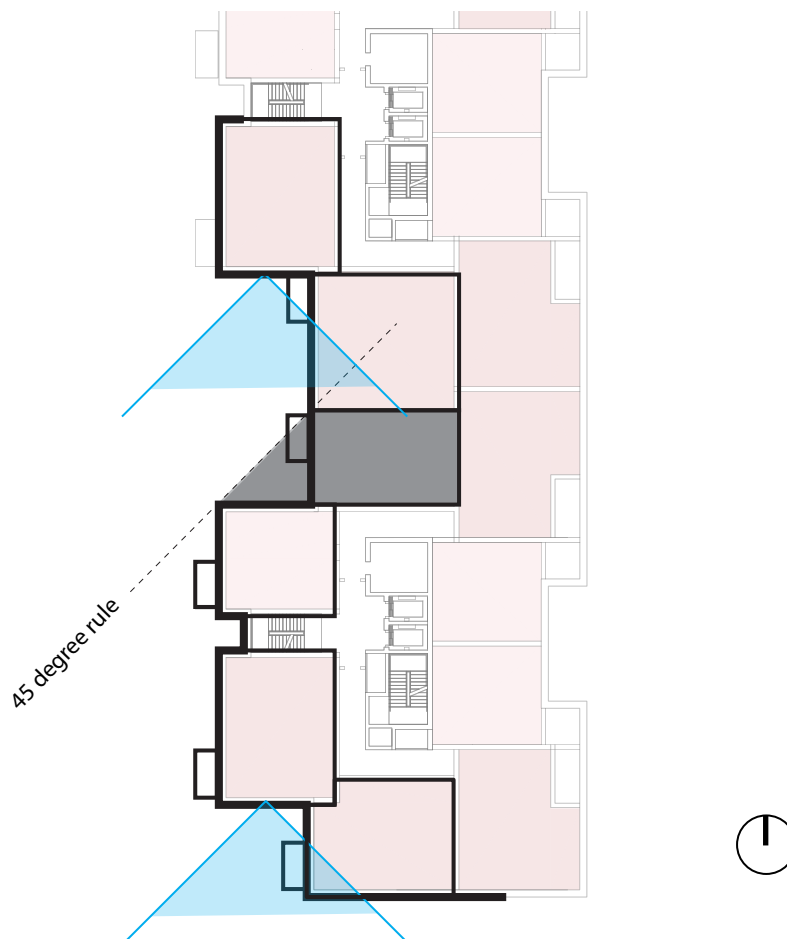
Impact of a stepped building frontage on overshadowing and overlooking
